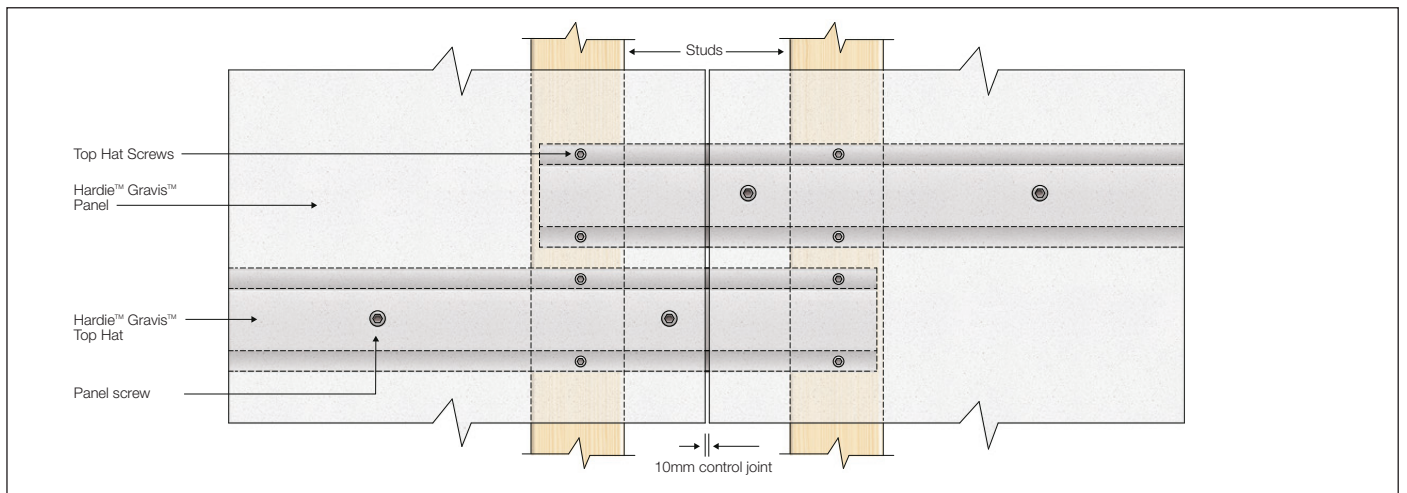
ZERO LOT WALL TYPICAL VERTICAL CONTROL JOINT - OPTION A
